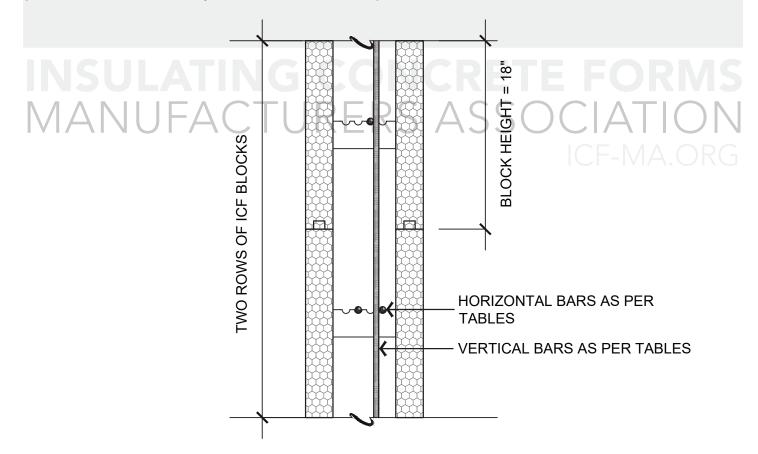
Above Grade Wall Reinforcing Placement for 6", 8" and 10" Thick Walls.
